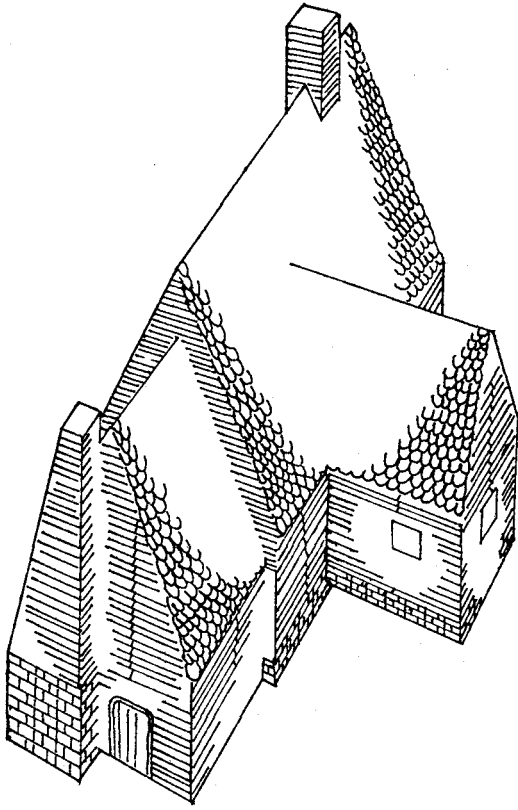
Reconstruction of the Peirse House showing brick piers and roofing tiles.
